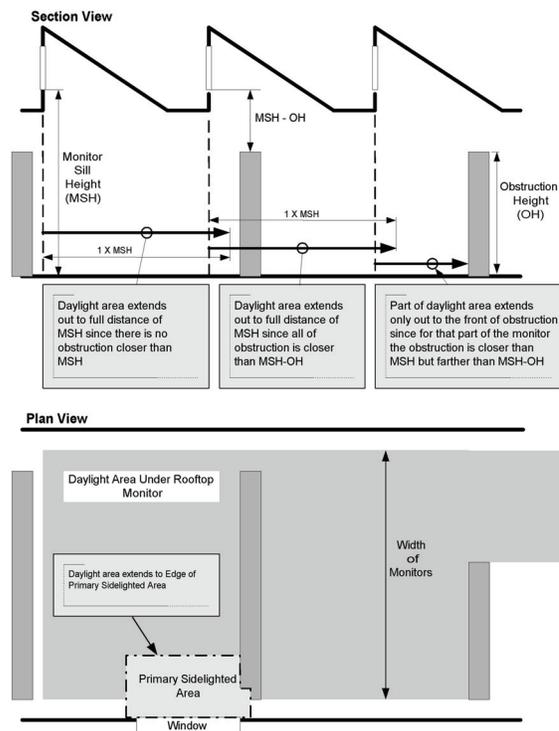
Section view and plan view of daylight zone under roof monitor.
